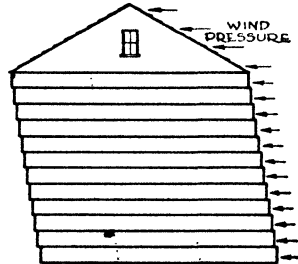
Conventional Sheathing on Ends; Little Diagonal Bracing Obtained; Boards Tend to Slip Edge on Edge, Distorting Building
